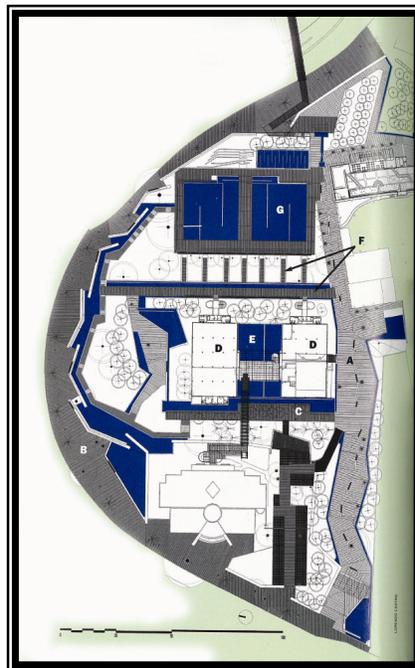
Parque del Agua Site Plan, Lorenzo Castro
